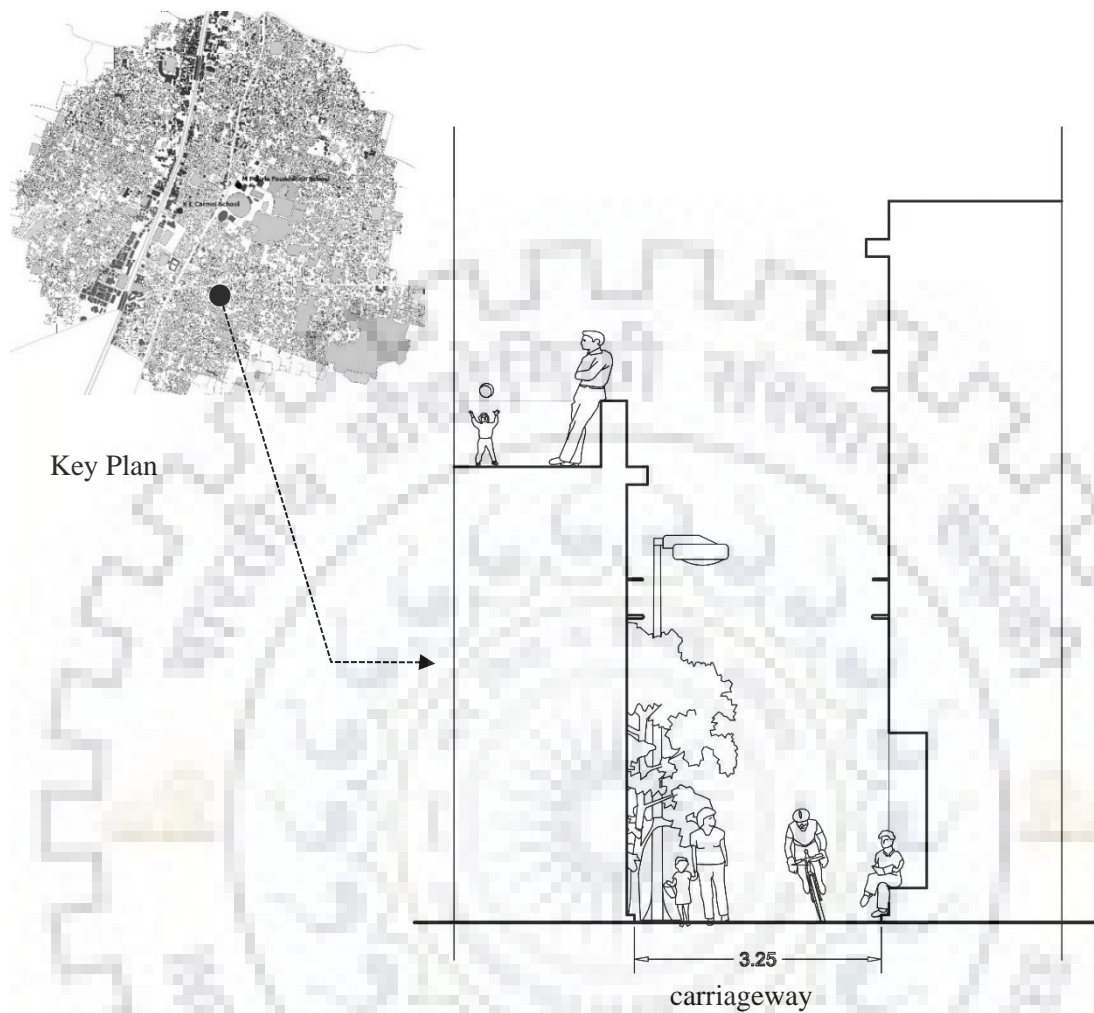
Street section of Banamali Ghosal Lane, Behala
